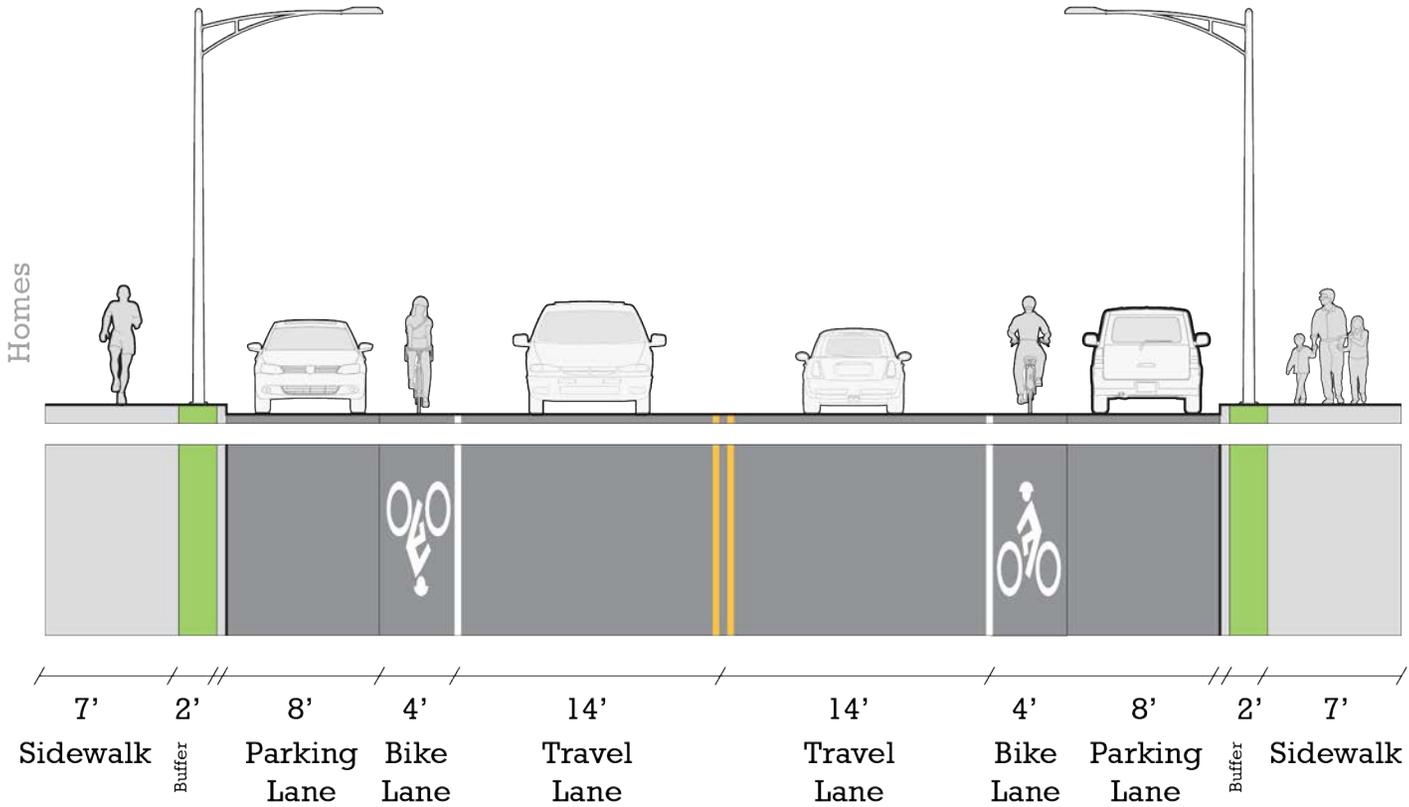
Arts Center Way Typical Section at 15th Street Facing North
